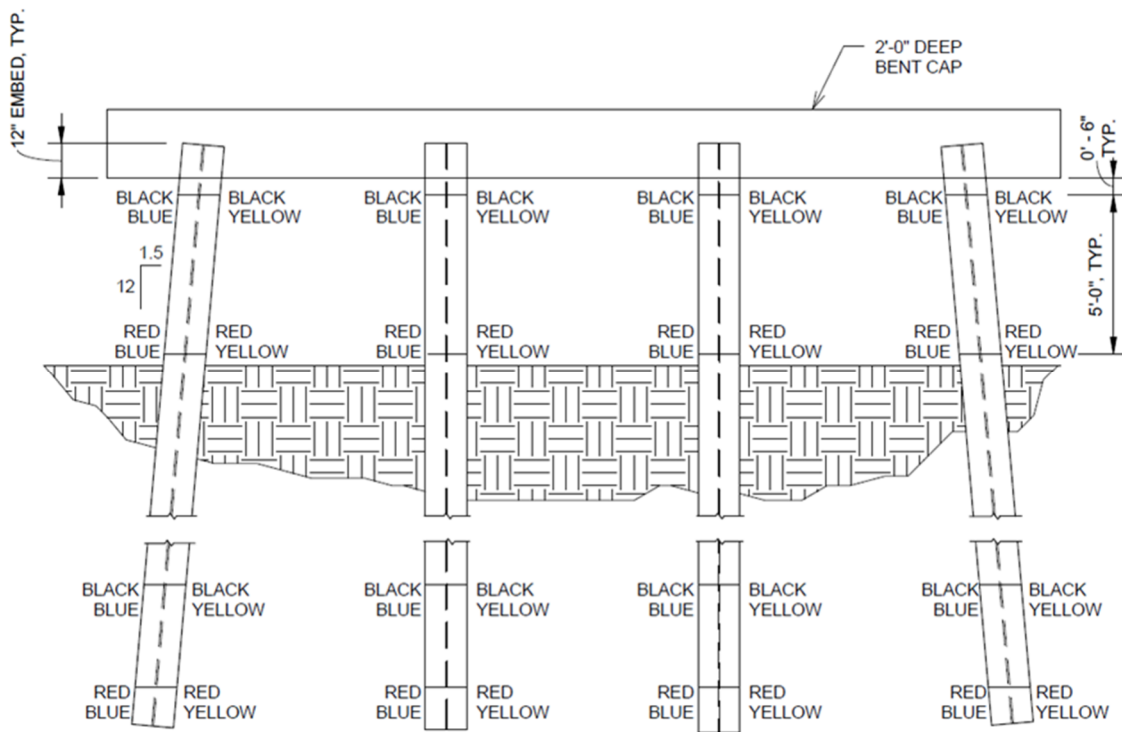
Instrumented Cross-sections on the Steel Piles (Courtesy of Campbell 2015)
